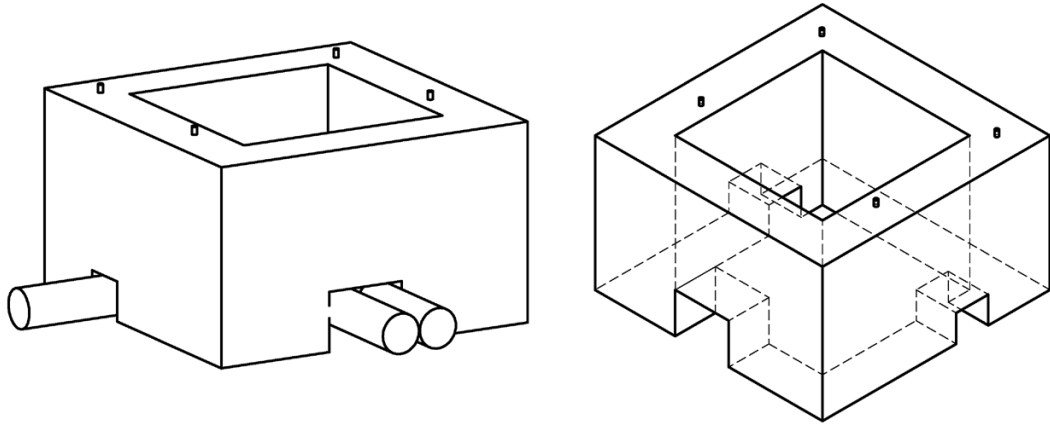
Example of a foundation with bolt anchors and recesses for the various cables
